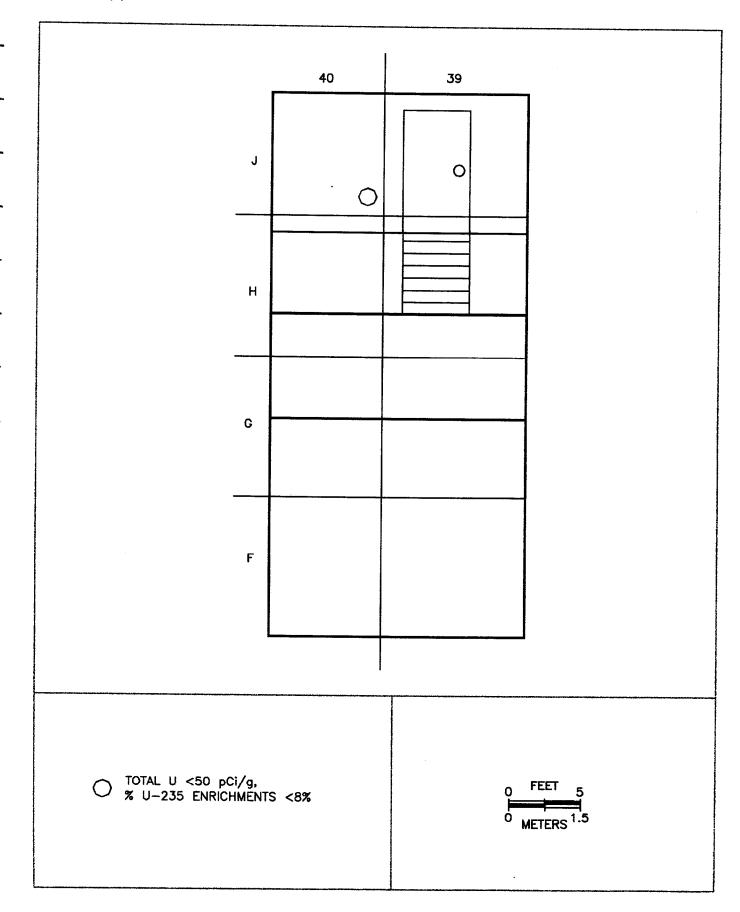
Building 3, High Bay, West Wall — Measurement and Sampling Locations
